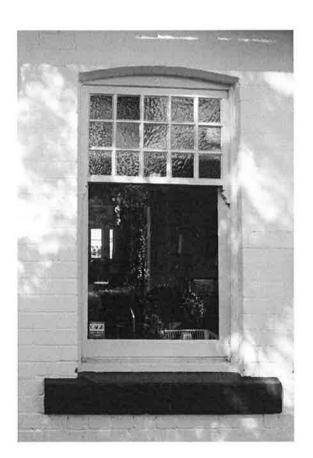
(Left) typical timber framed double hung window, "Lansdowne"
